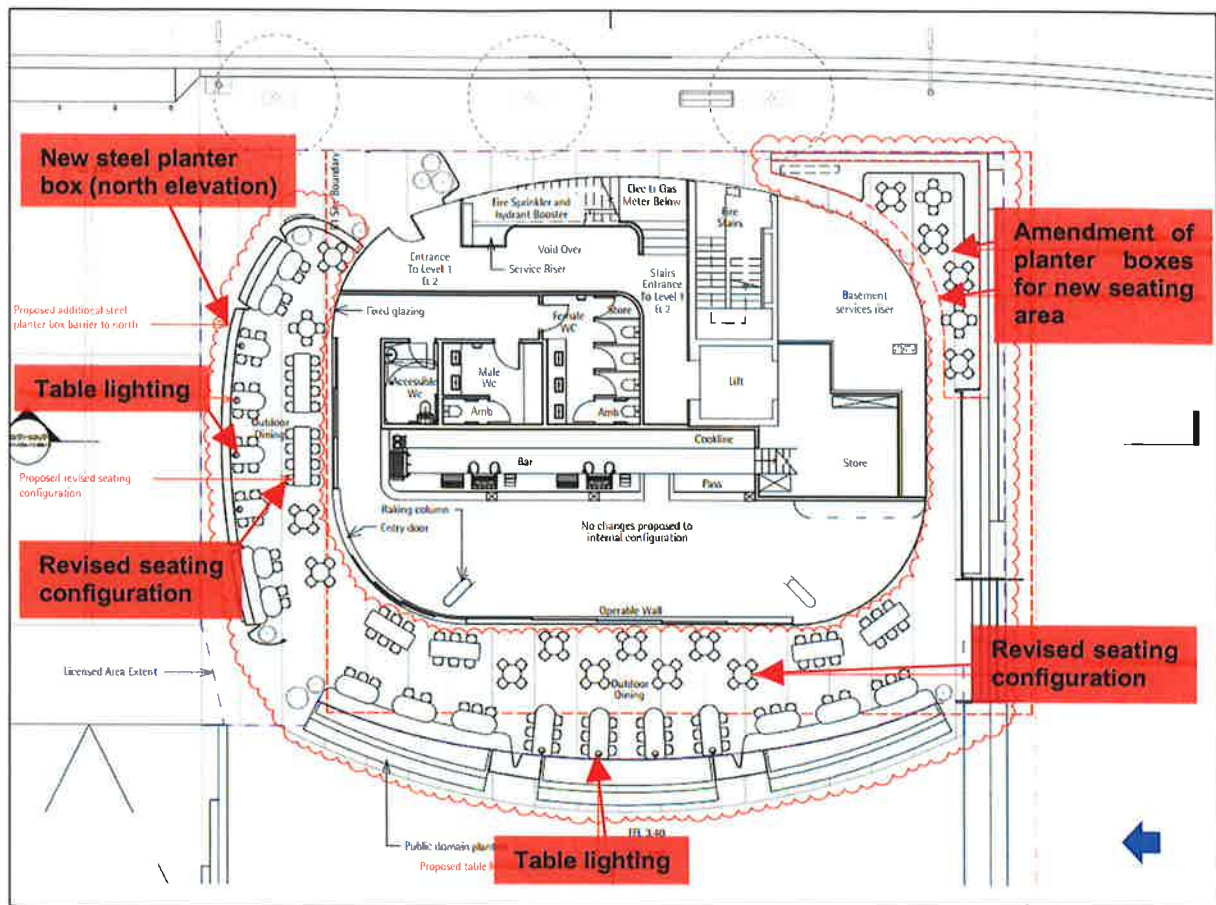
Proposed modifications to ground floor fit-out (Source: Applicant)
